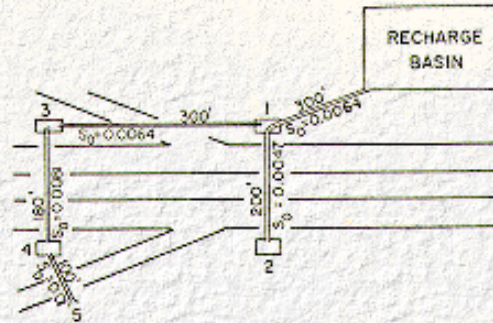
Figure A. Storm drain system layout, including five catch basins and five pipe runs
